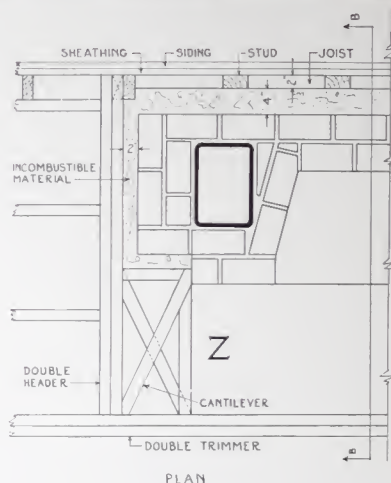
PROTECTION AROUND FIREPLACE EXTENDING THROUGH OUTSIDE WALL.
